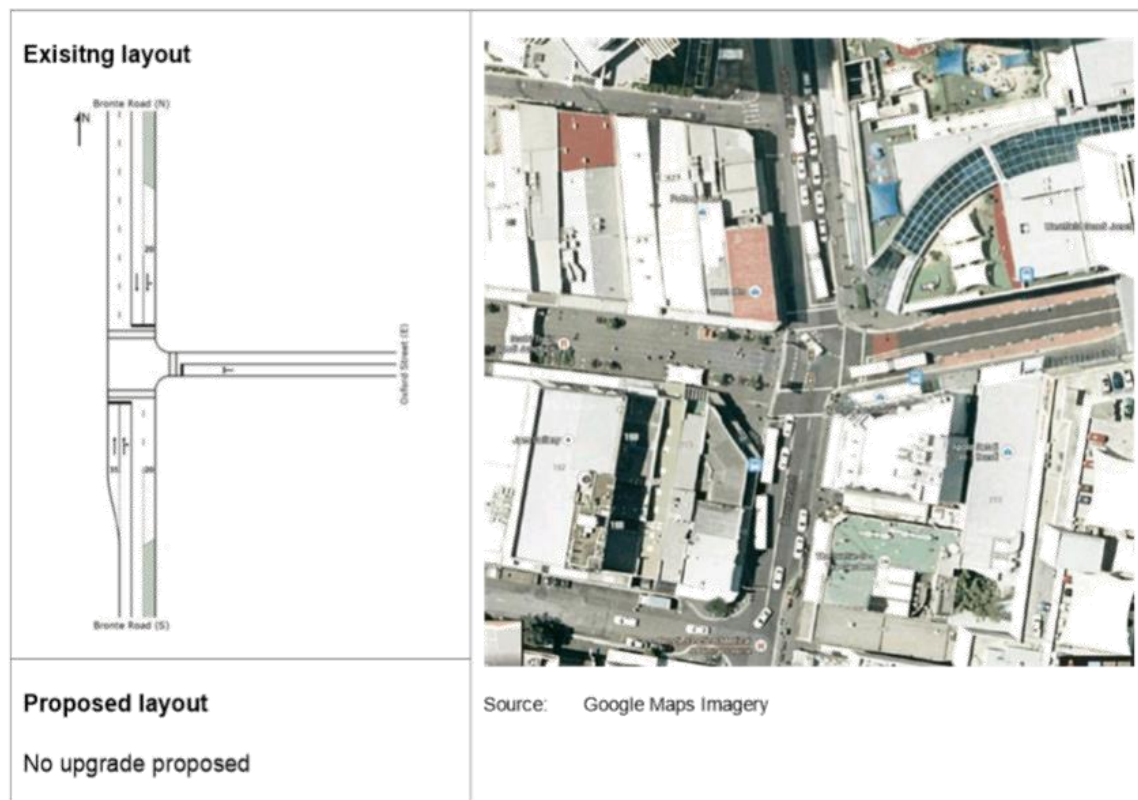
Oxford Street and Bronte Road Intersection layout
